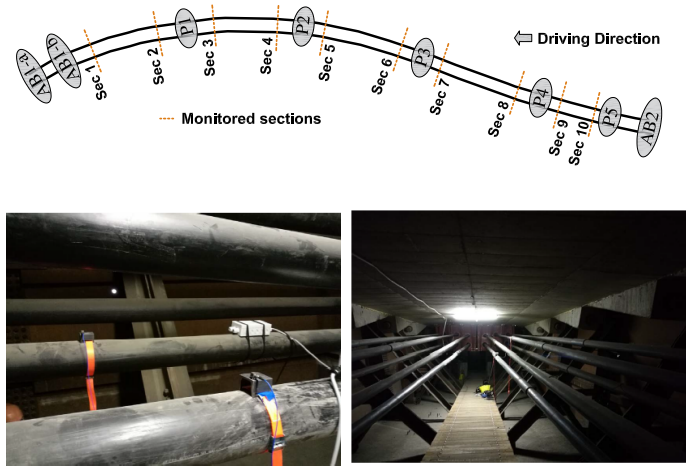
Monitoring system installation: (1) Plan view of the monitored highway viaduct. (2) MEMS accelerometers installed on the external steel tendons. (3) External prestressing tendons.
